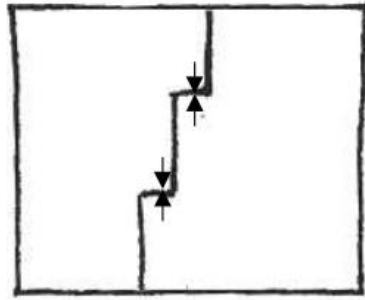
Renovation of the adobe wall by creating stepped work joints [15].
